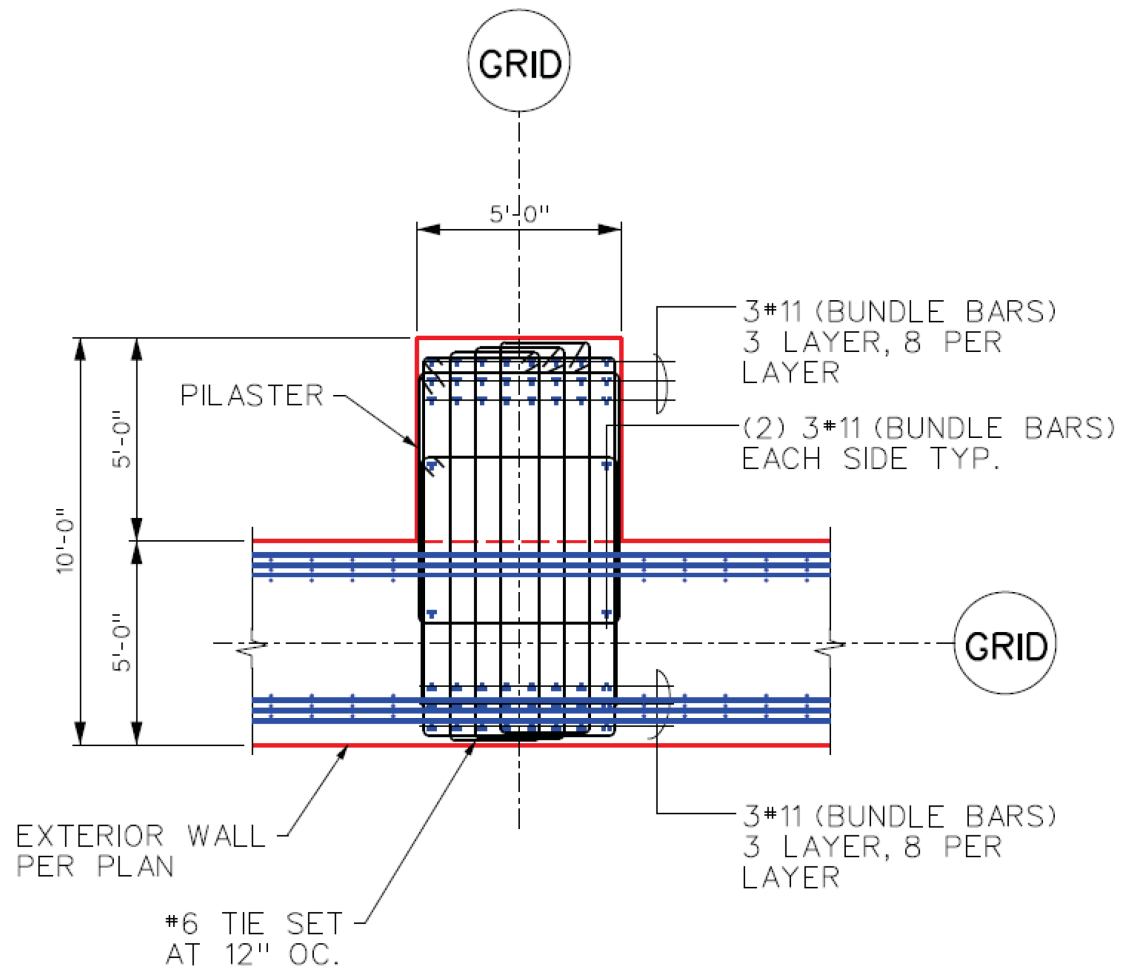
B-35: RXB Reinforcement Detail for Pilaster Type 4
